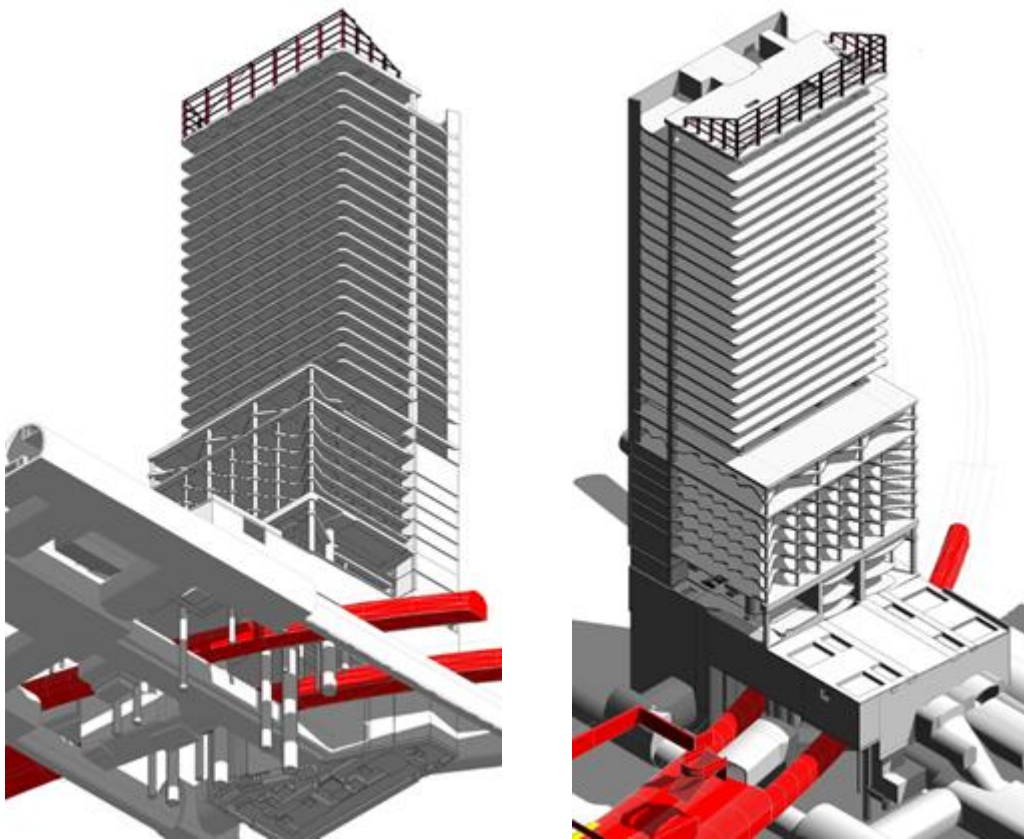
South Tower and station structure integrated and designed from foundation to roof top with new and existing tunnels beneath.
